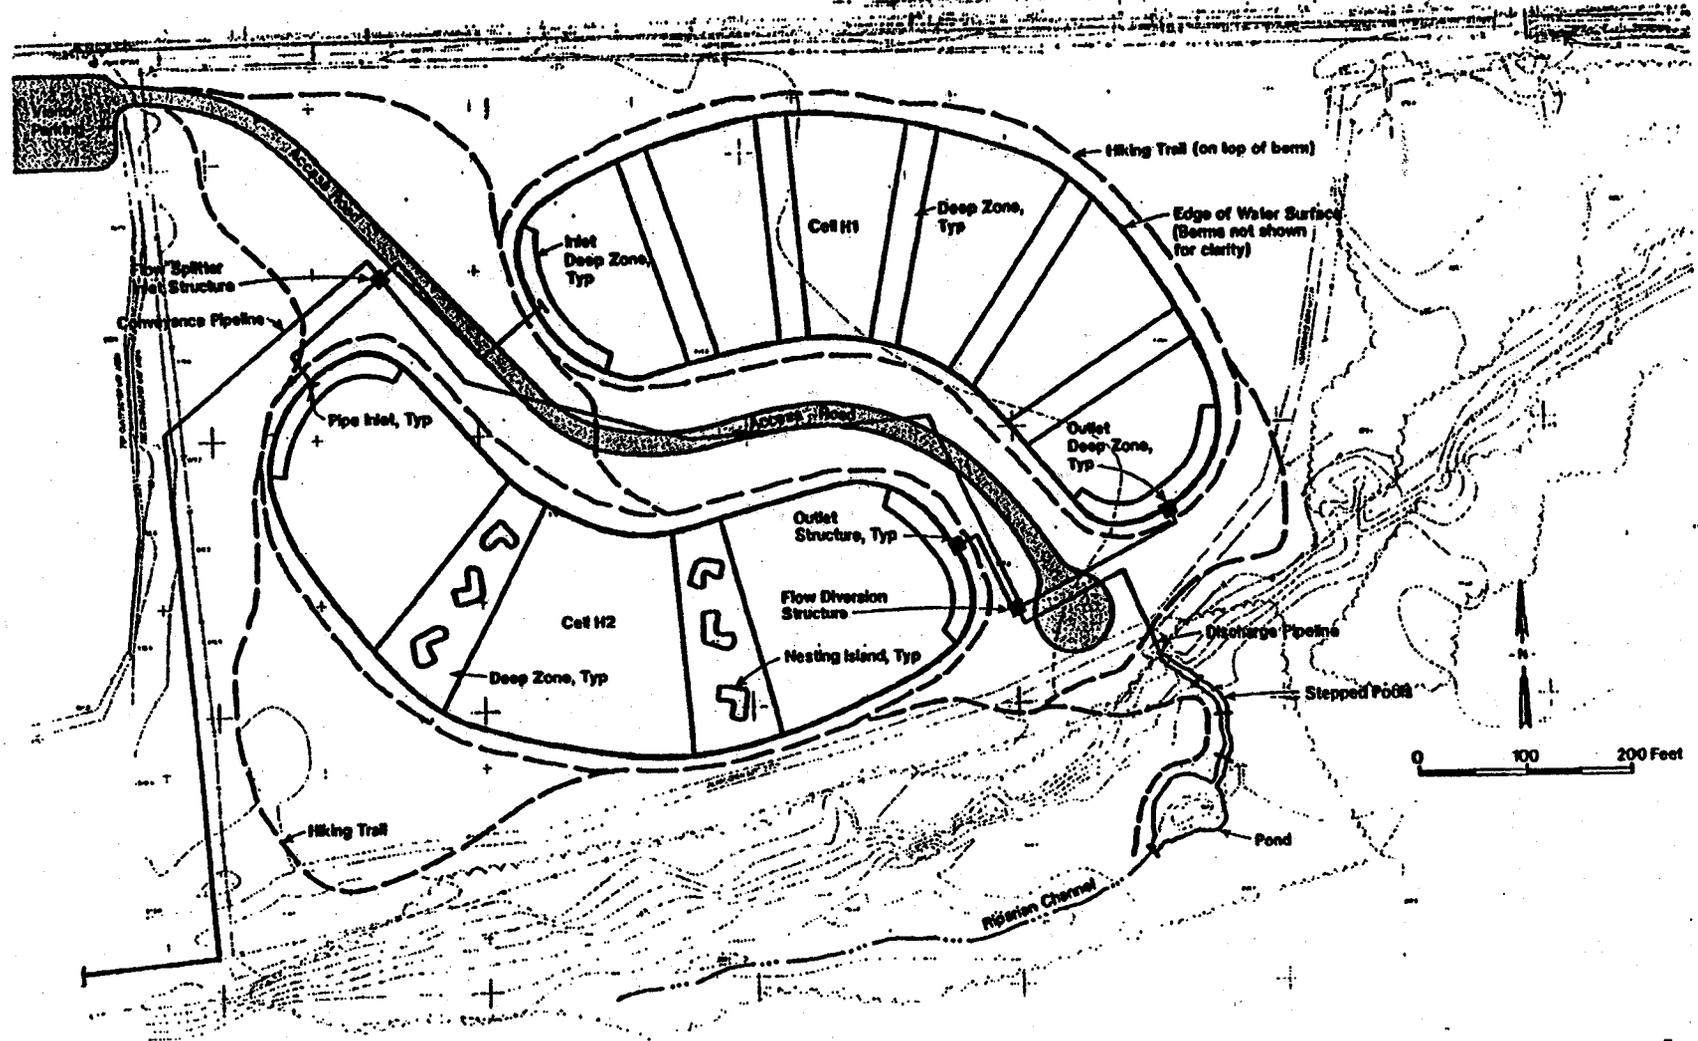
Hayfield Site layout—Tres Rios Demonstration Constructed Wetlands.
